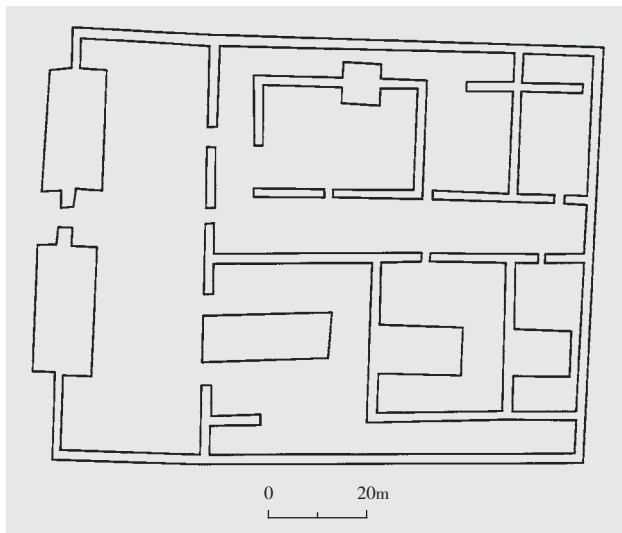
The plan of the architectural foundation no. 5 of the Weiling Mausoleum.
